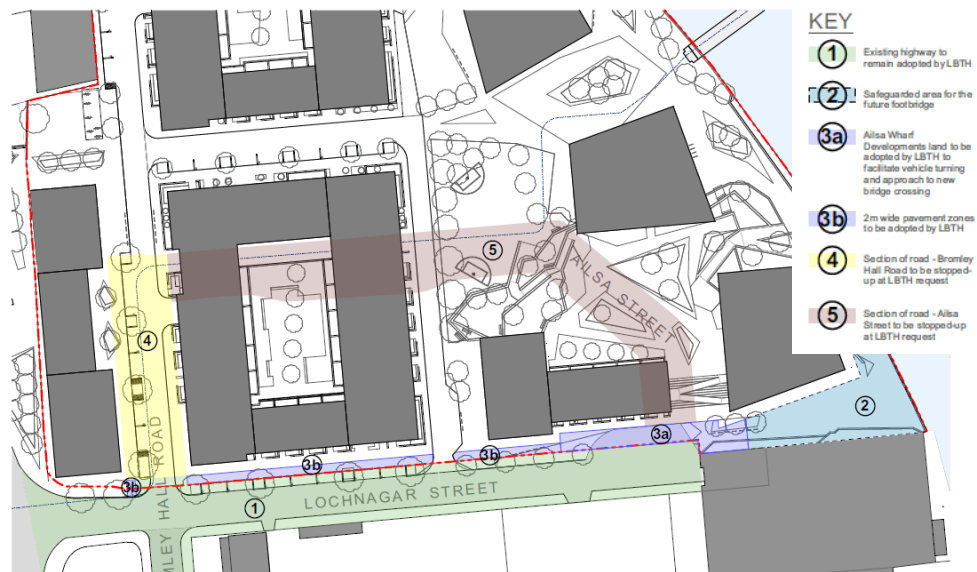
Plan showing highways to be adopted/ stopped up and safeguarded bridge landing area
